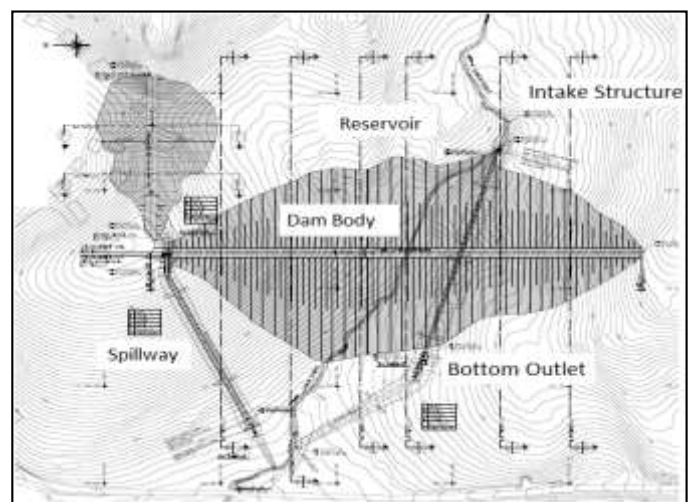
General Layout of Kızık Dam (State Hydraulic Works, 2013)
